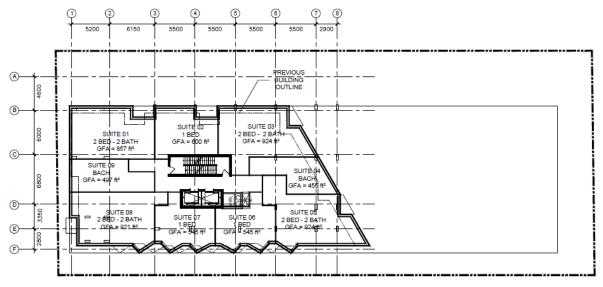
Floor Plans for levels 5-10 illustrate the orientation of views is designed to reduce the overview of the Queensway. Levels 11 -15 maintain the same footprint, but the layouts of individual suites are different with 8 units, and the floor plan for the penthouse includes 4 suites within the footprint.
